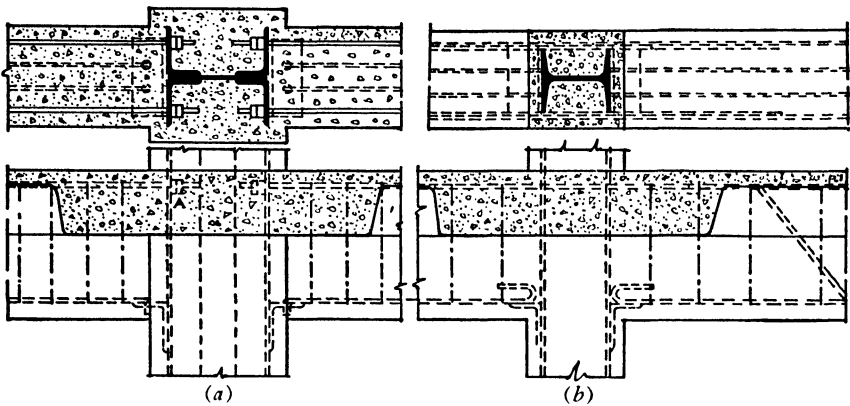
Combination Reinforced Concrete and Structural Steel Frame. (a) discontinuous reinforcement; (b) continuous reinforcement.
